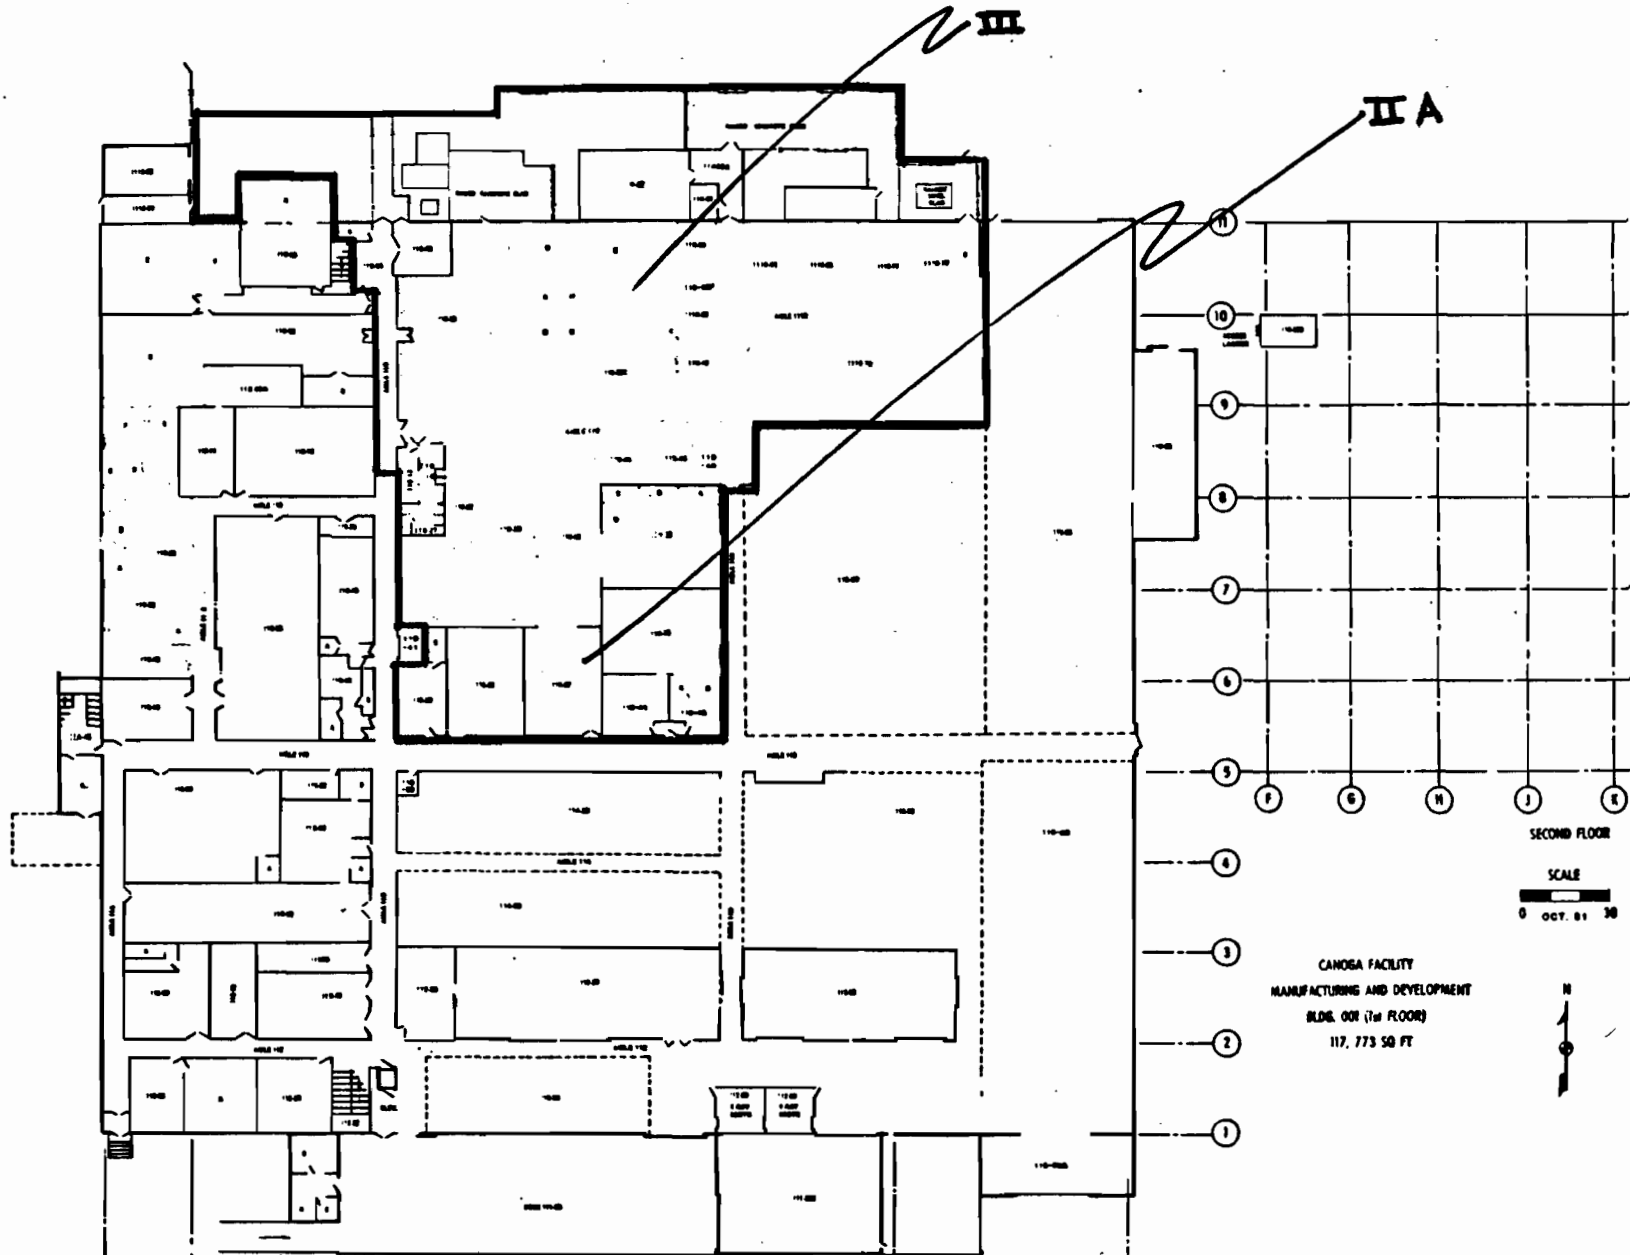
Ground-Floor Layout of Building 001, Showing Regions IIA and III
